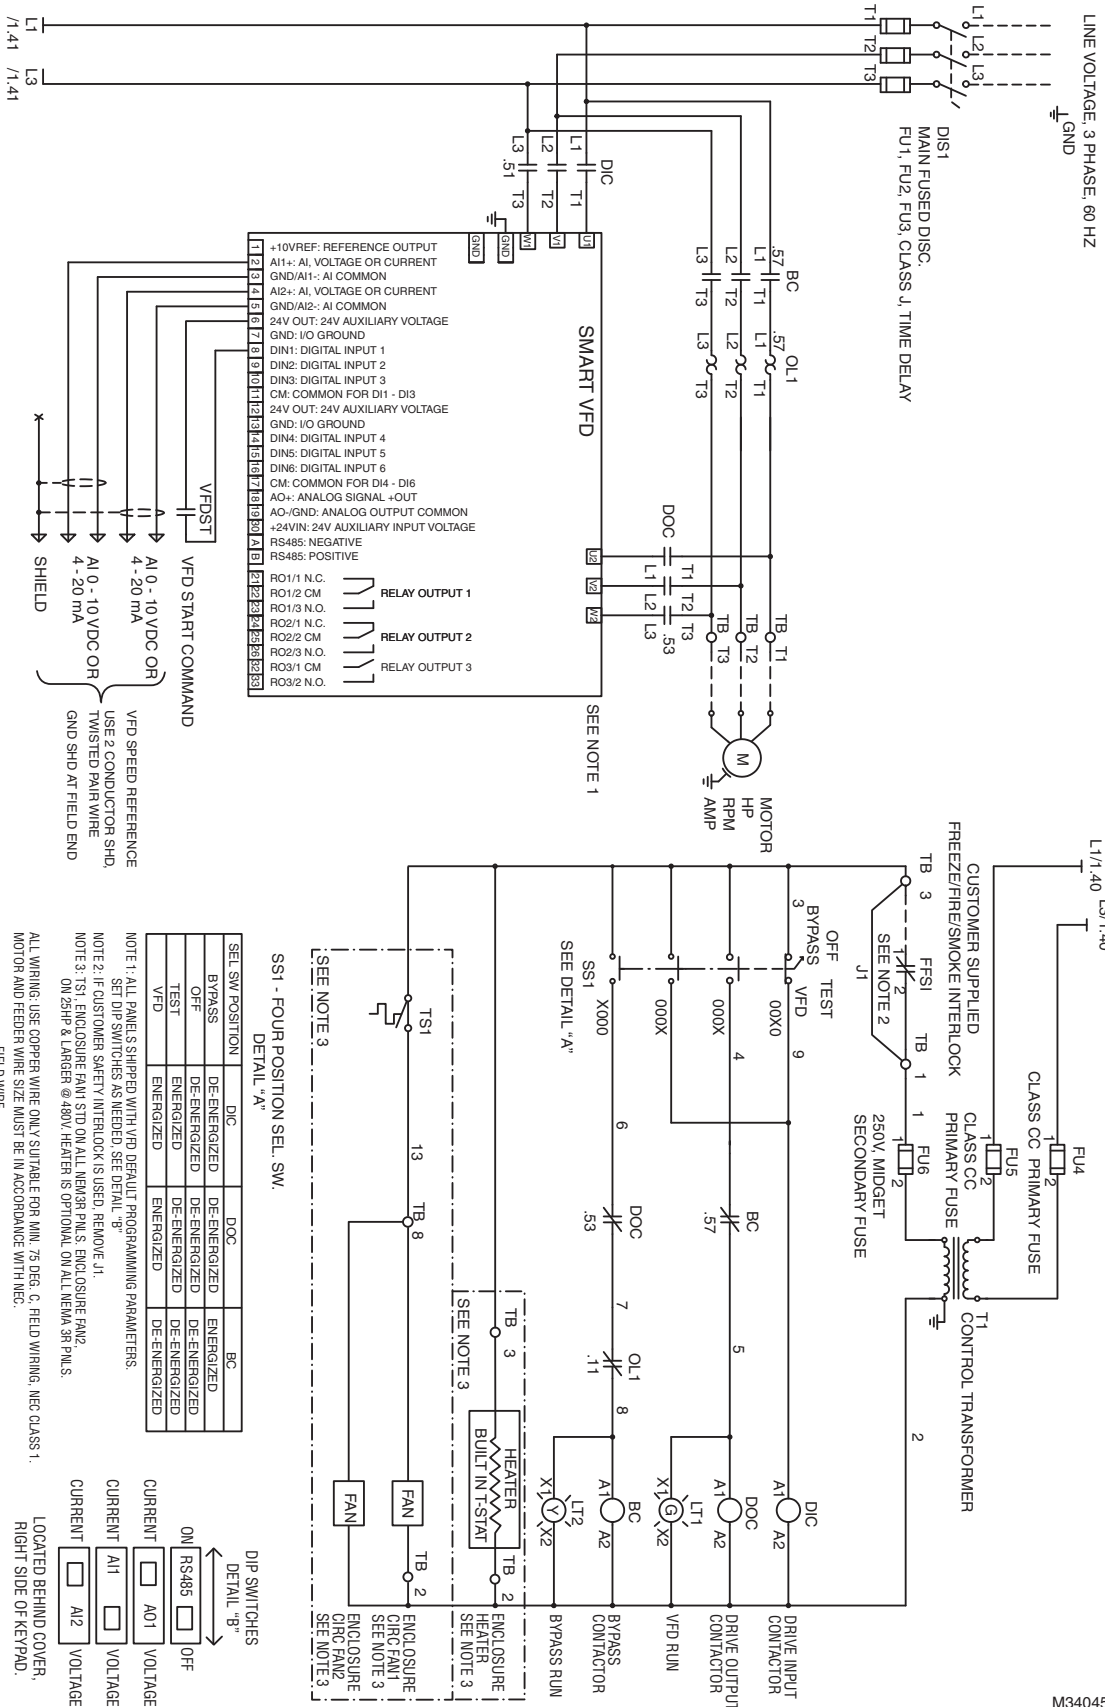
Frame 6, 3 Contactor Wiring Diagram
